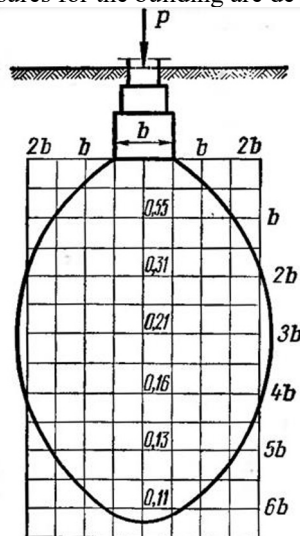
Stressed zone of the base soil under the foundation sole: b - width of the foundation sole; P - load from the building, transferred by the foundation to the base
